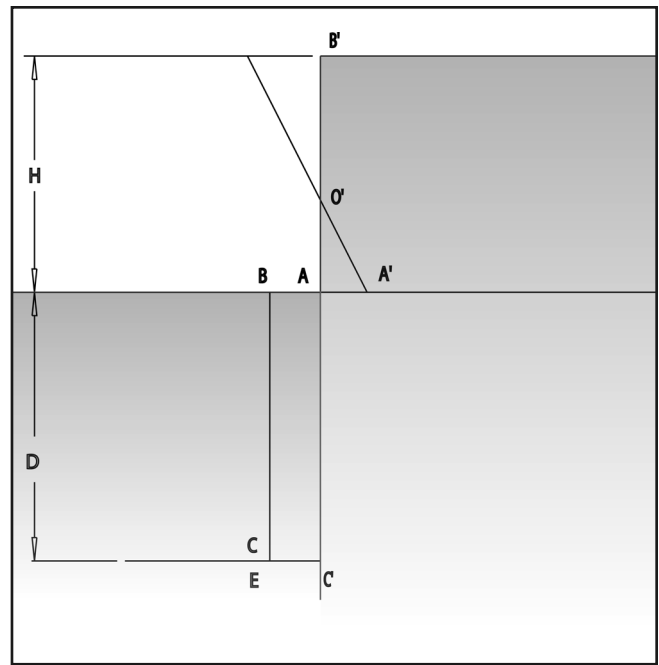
Initial Earth Pressure for Design of Cantilever Sheet Piling Entirely in Cohesive Soil, Simplified Method
